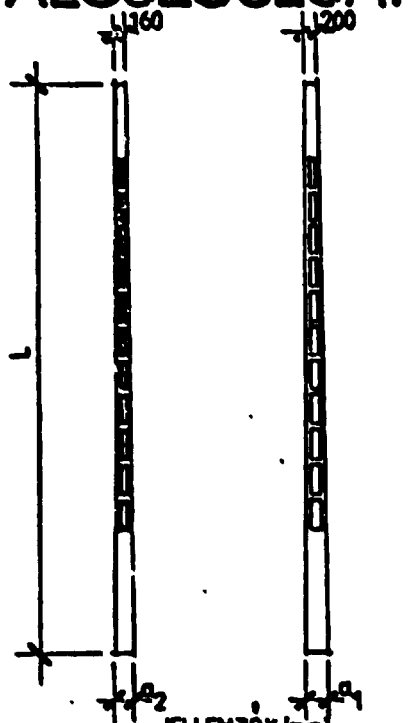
Reinforced concrete beams for the construction of the bridge.
